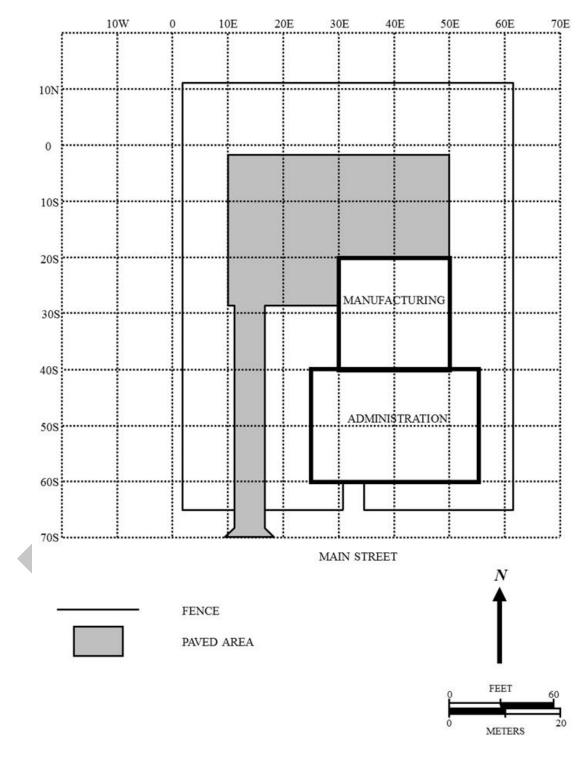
Plot Plan of the Specialty Source Manufacturing Company
